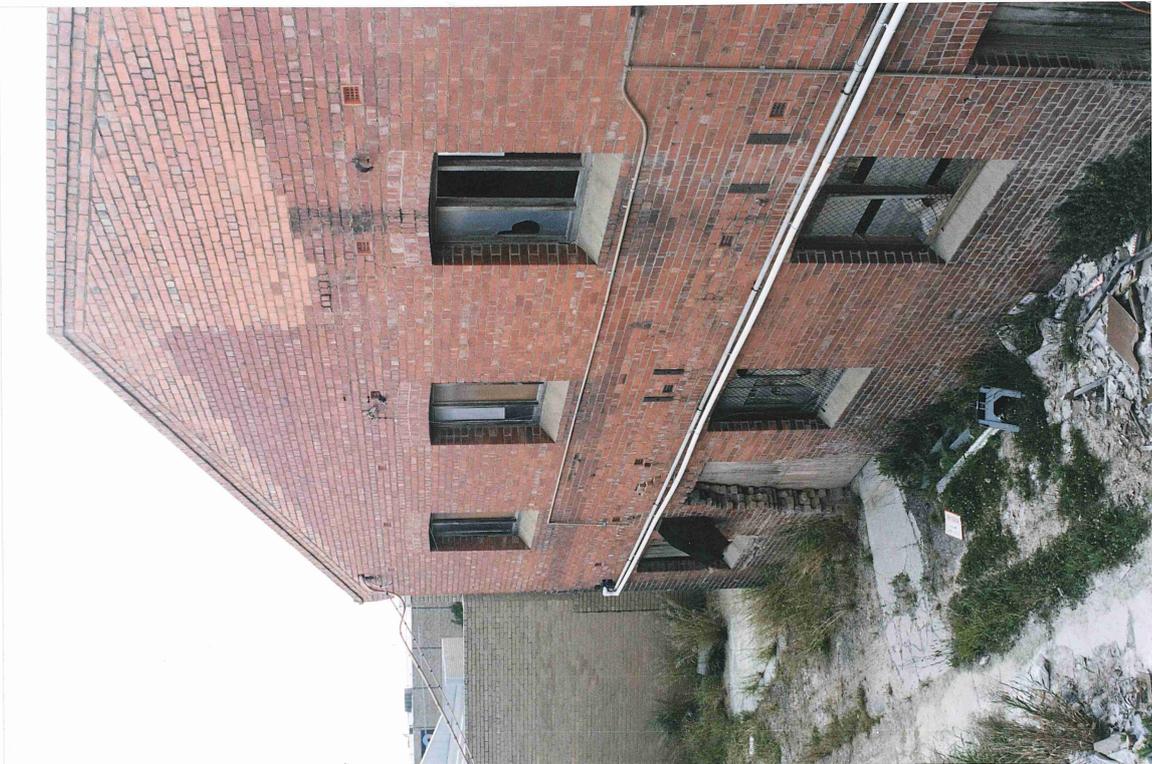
Building 19. Photograph shows the modified north wall with evidence of the former saw-tooth roof. This wall has been identified as structurally unsound.
